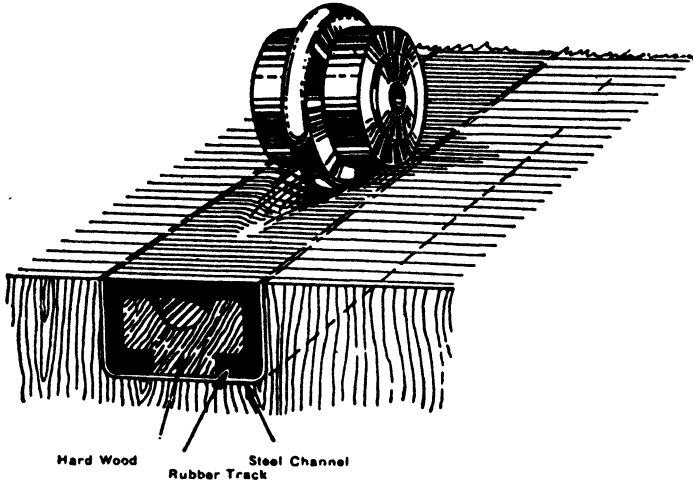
A TYPE OF SLIDING DOOR TRACK
